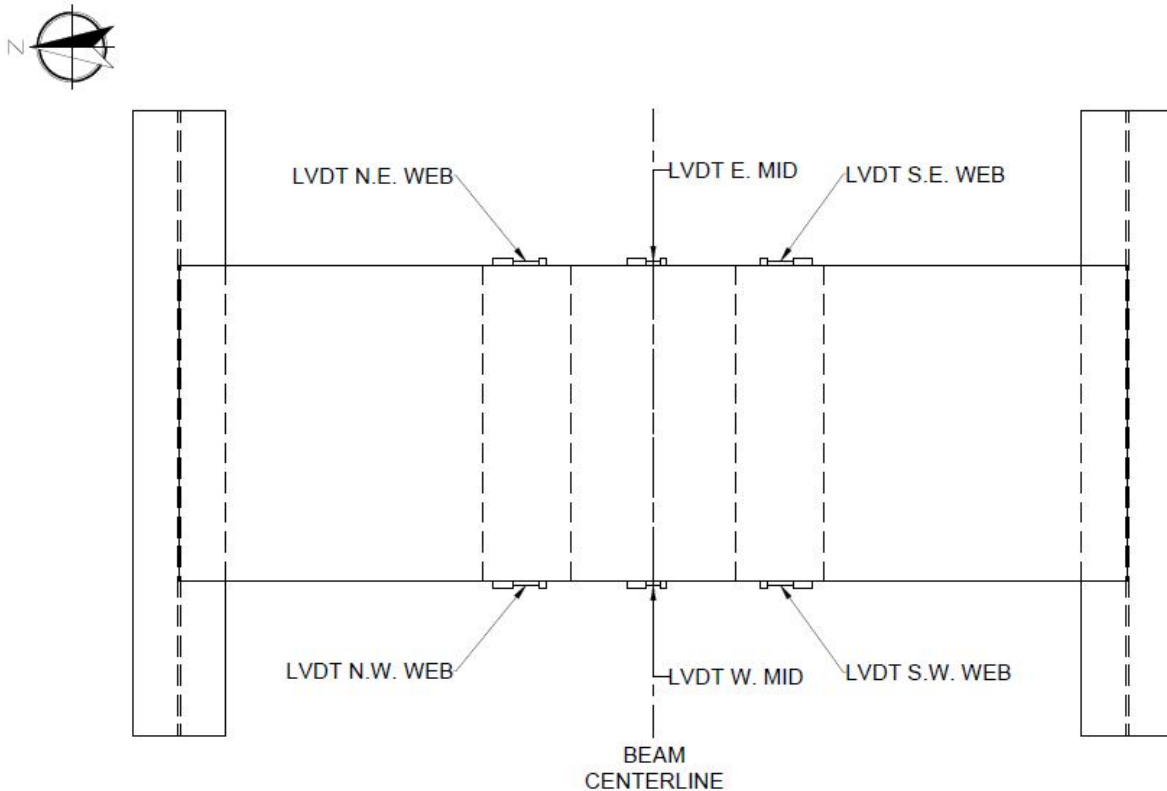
Plan view on inverted T-beam subassembly specimen, showing arrangement and naming convention of LVDT's
